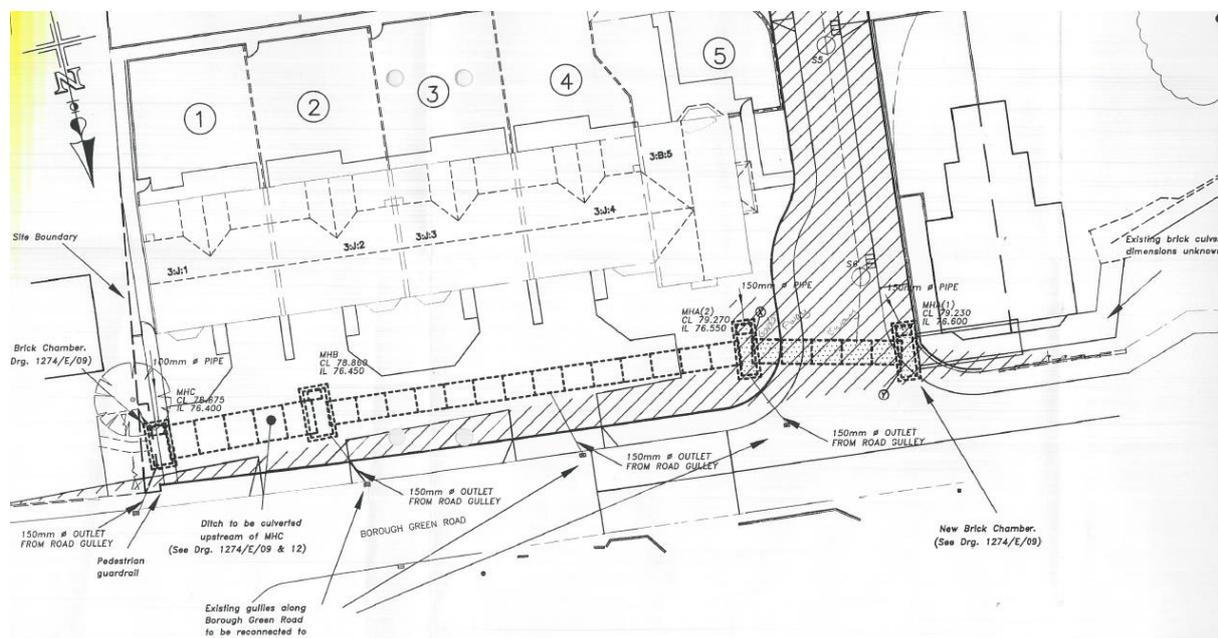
Site Plan for Durling's Orchard Development with culvert details.
